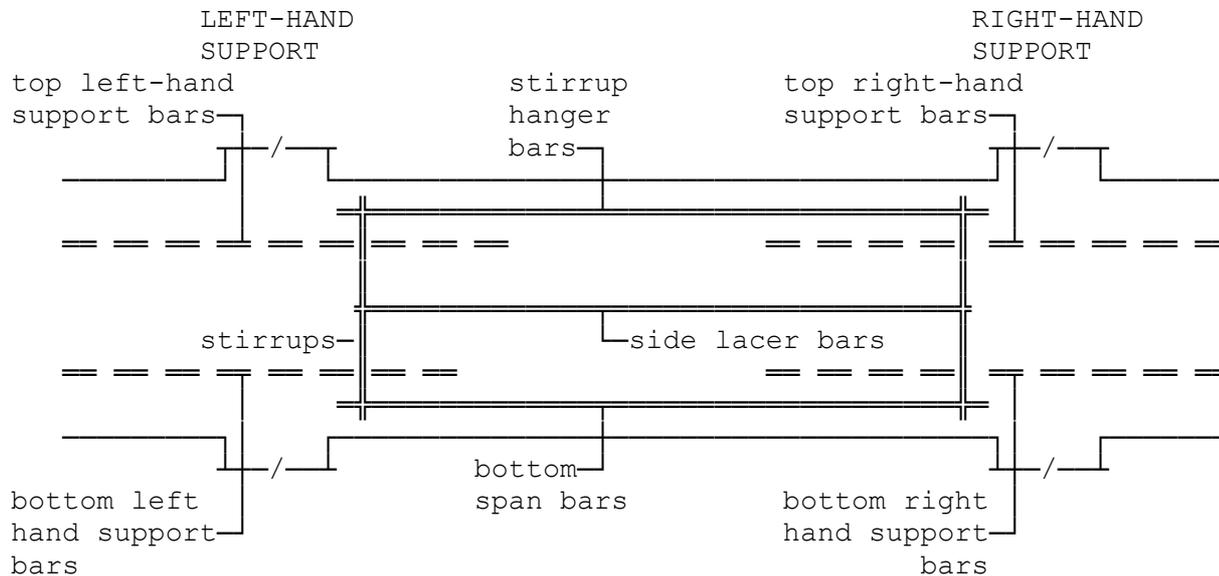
(a) - EXPLODED VIEW OF BEAM
